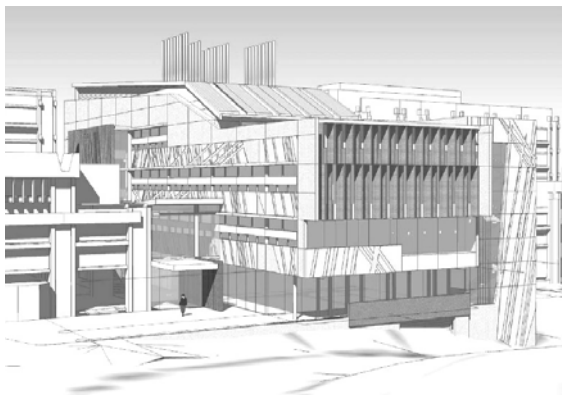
First multi-storey PRESSS-Building in New Zealand (Structural Engineers: Dunning Thornton Consultants; Cattanach and Pampanin, 2008).
